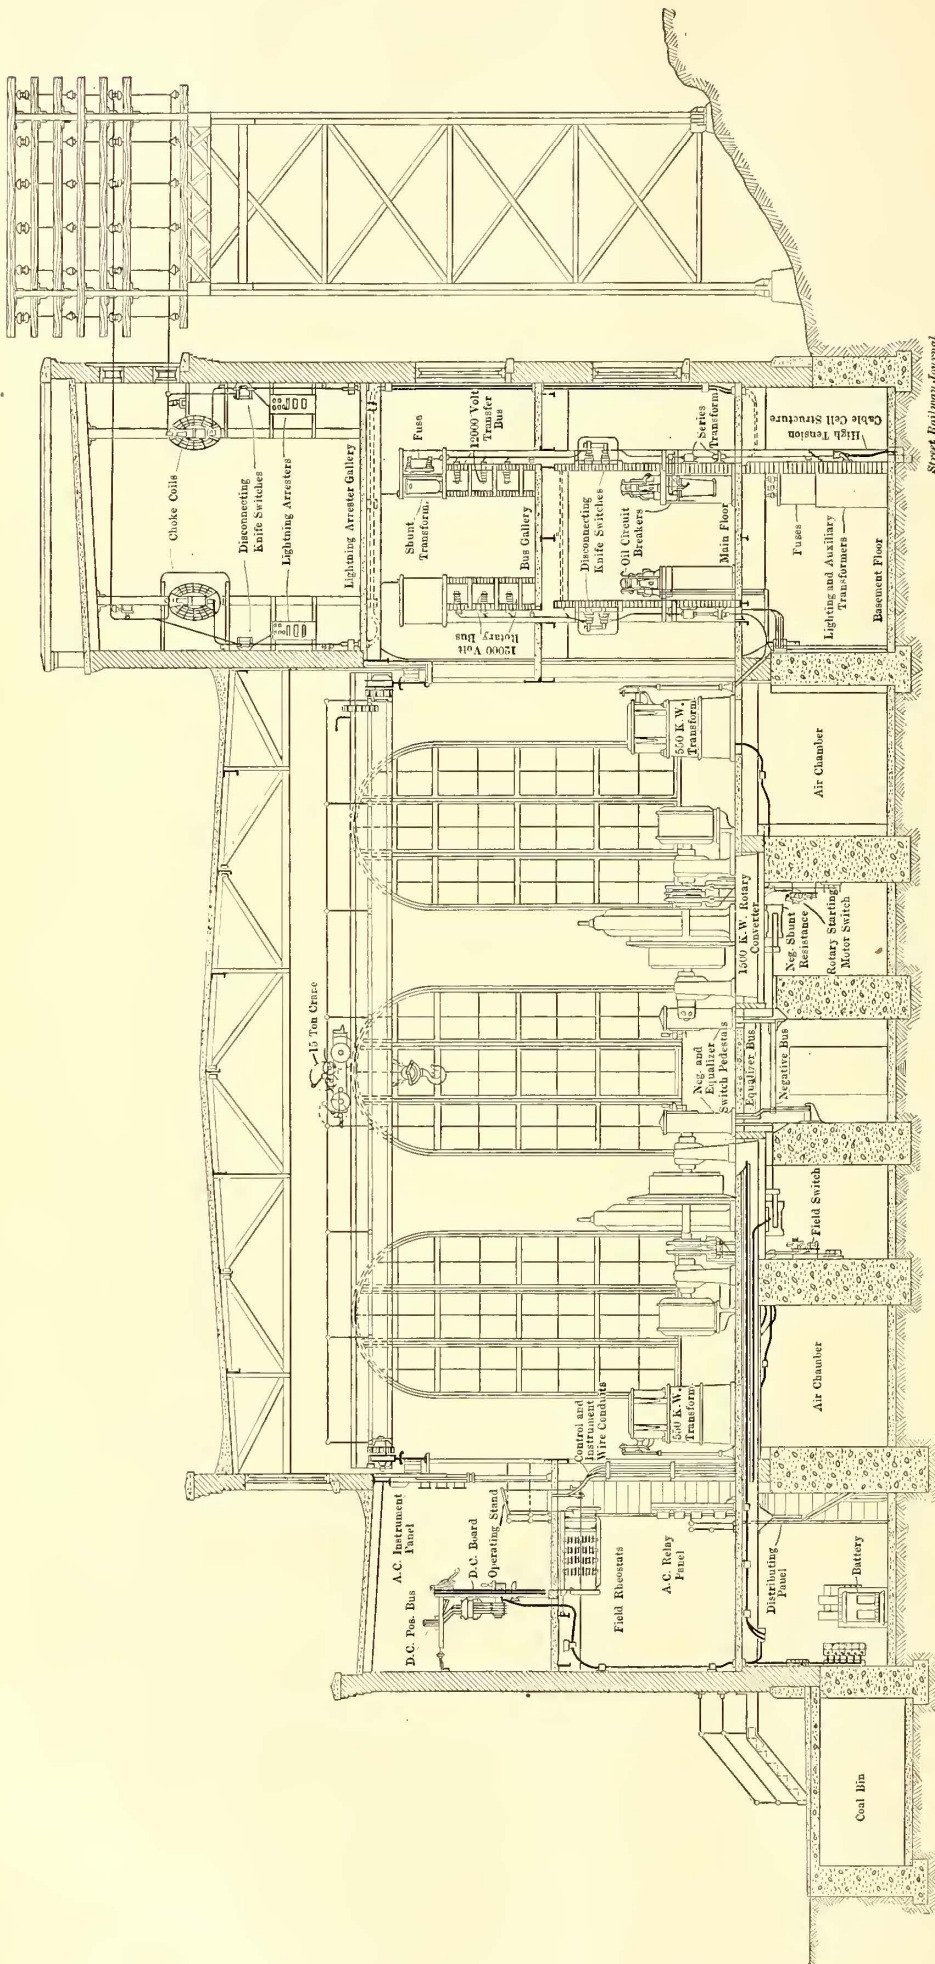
ELEVATION OF WOOD HAVEN JUNCTION SUB-STATION
